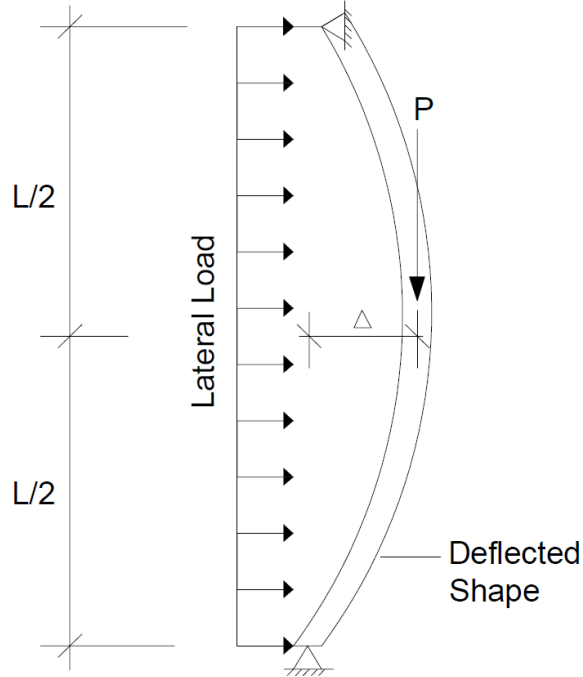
Deflected Shape of Out of Plane Load Bearing Walls.
